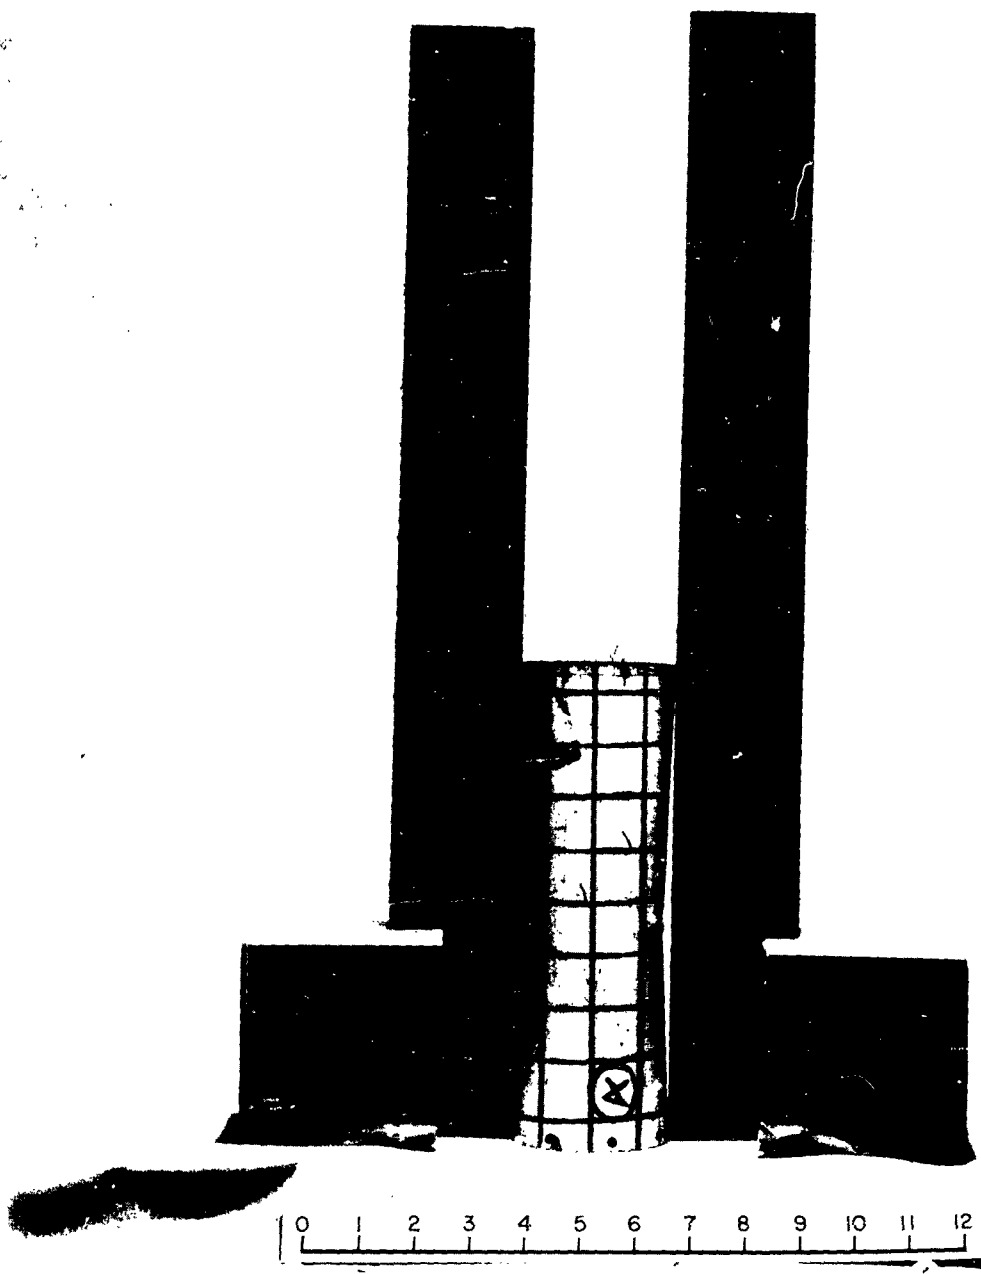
SHELL NO. 5 - SIDE VIEW
